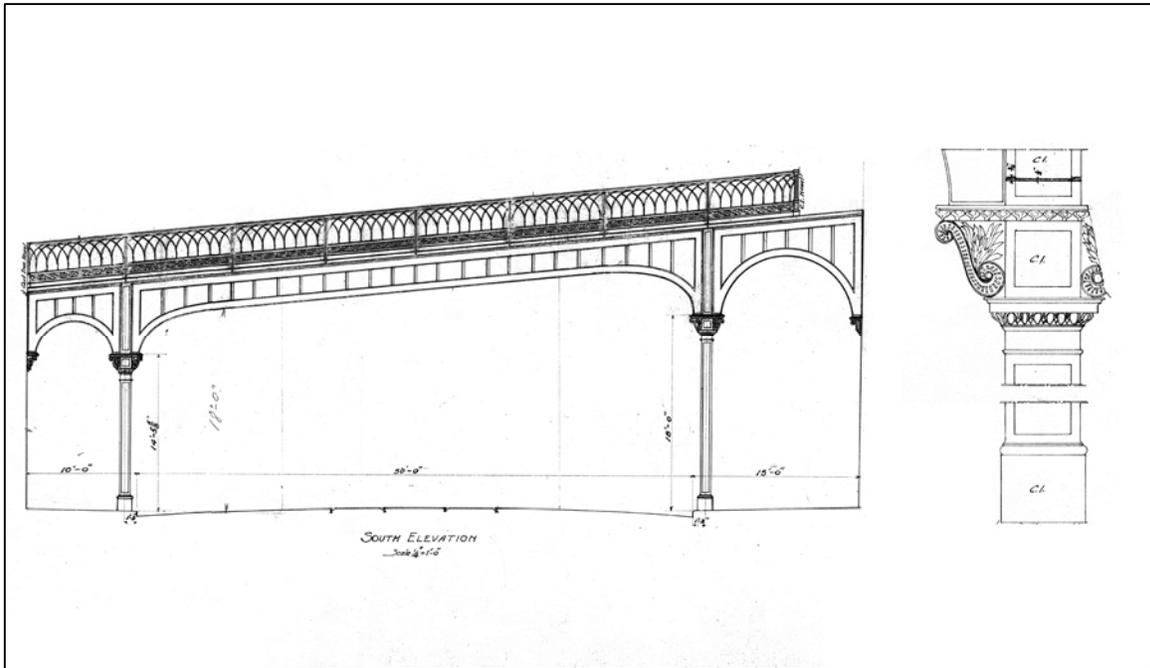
A detail of the bridge plans showing the decorative design elements and iron railing. Plan 4-18. 1909. Seattle Department of Transportation.
